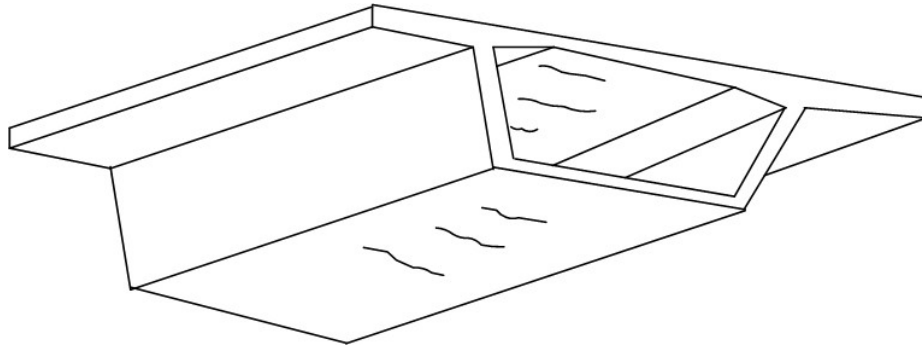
Thermally Induced Transverse Cracks in Box Girder Flanges
